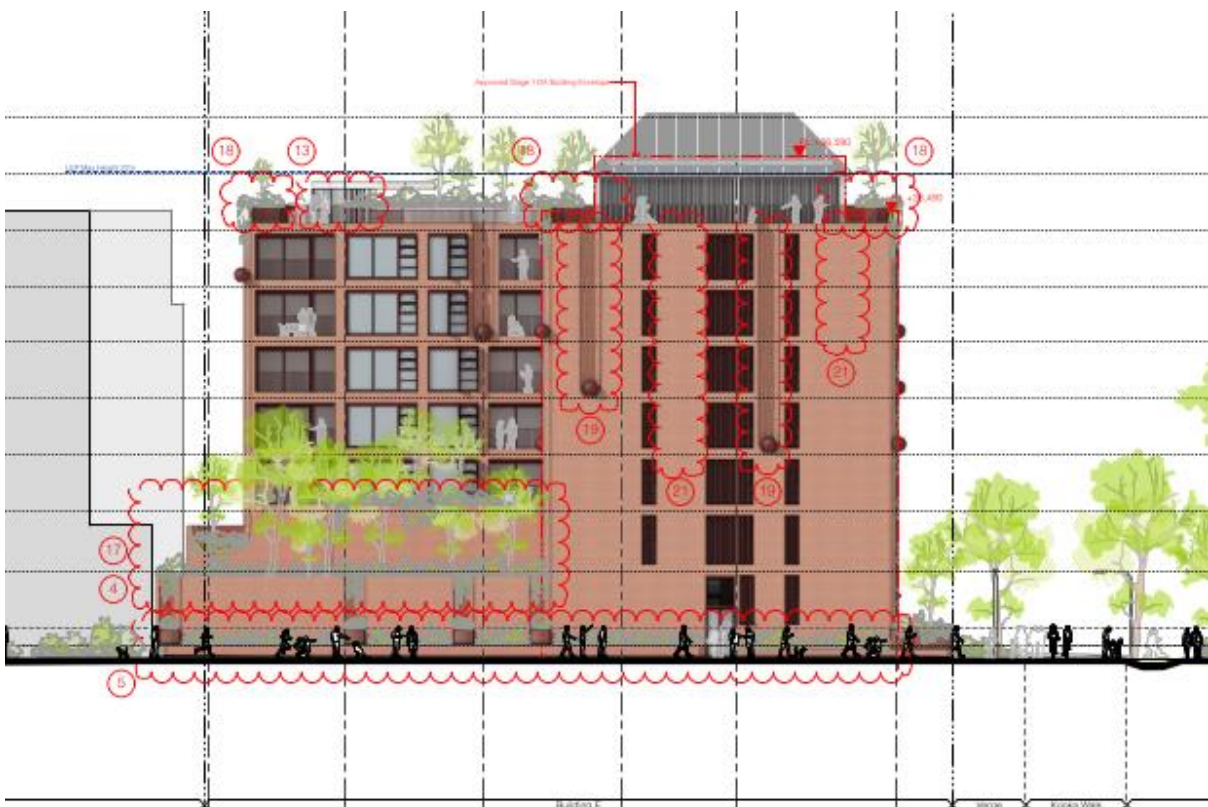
Proposed internal south elevation (to pedestrian link within site)
